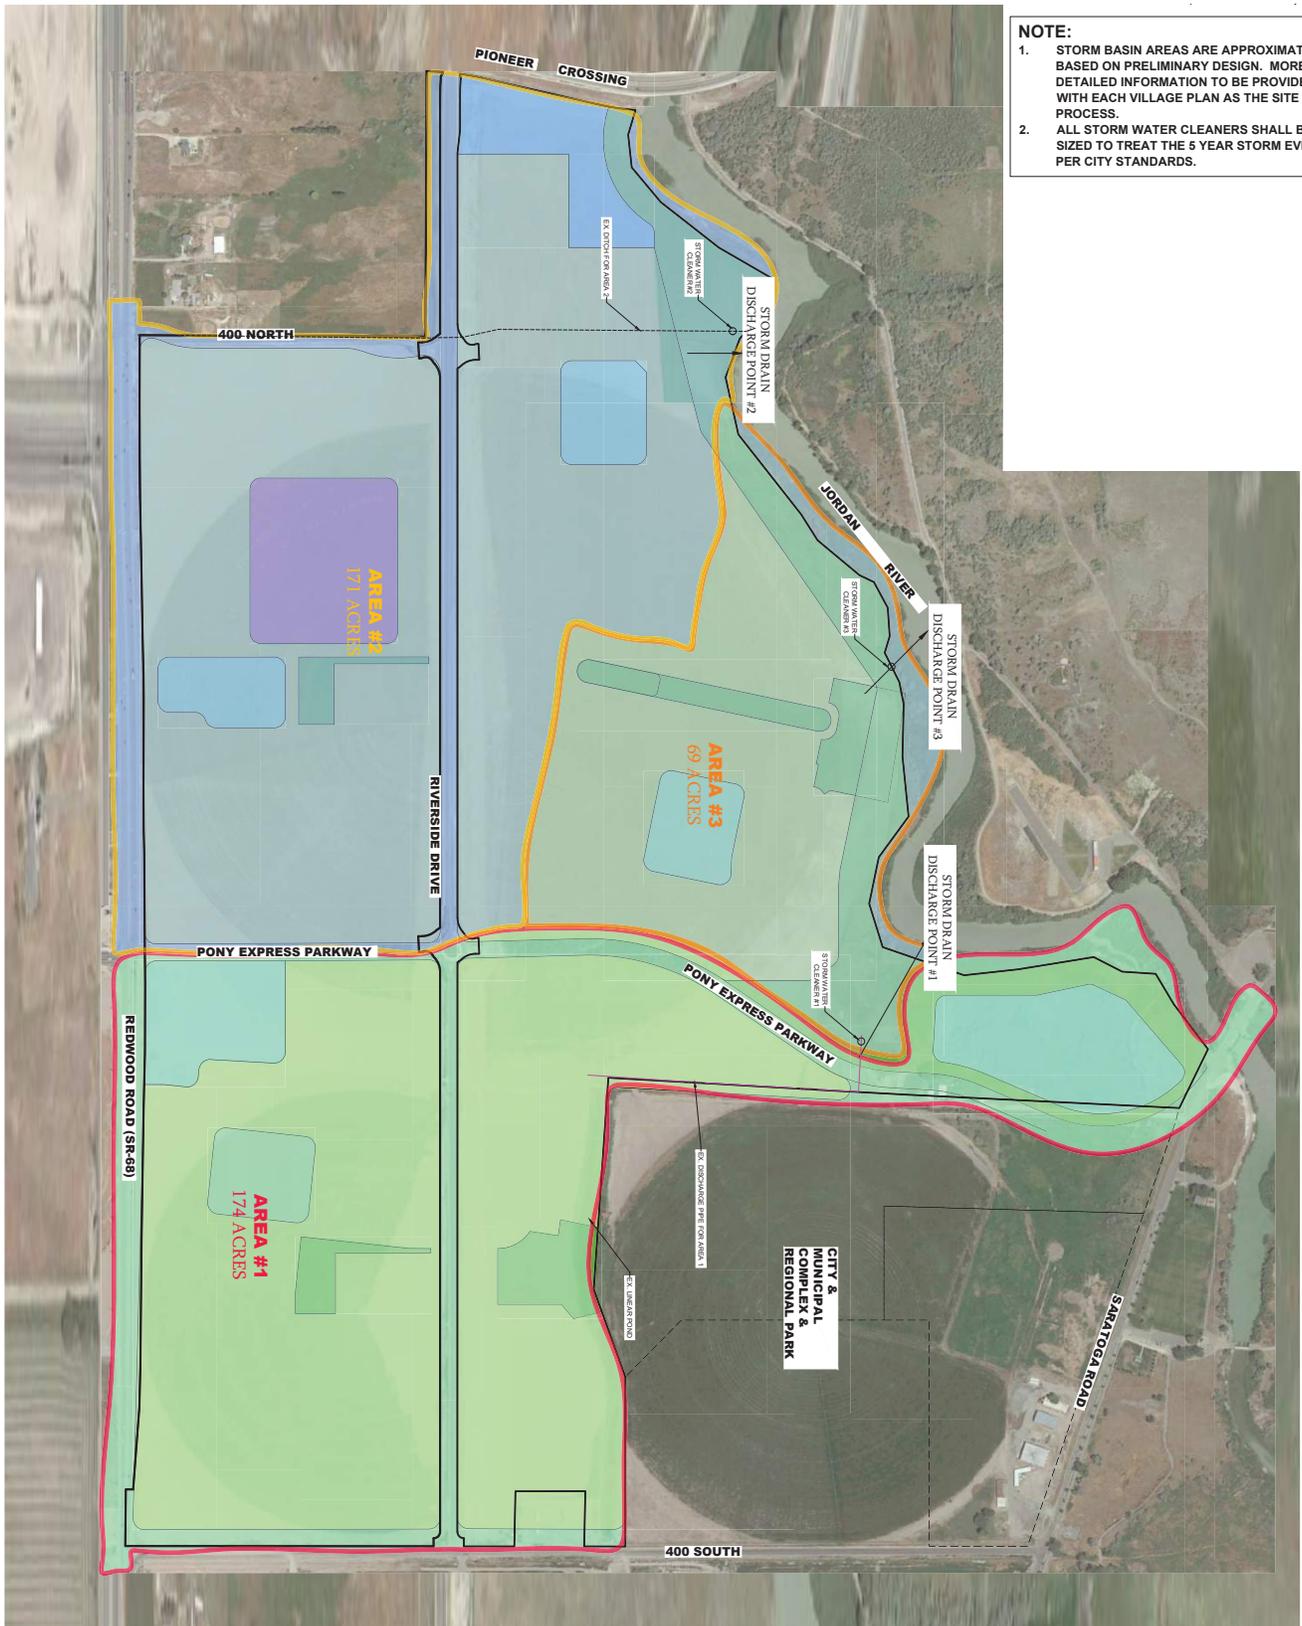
STORM DRAIN MASTER PLAN
